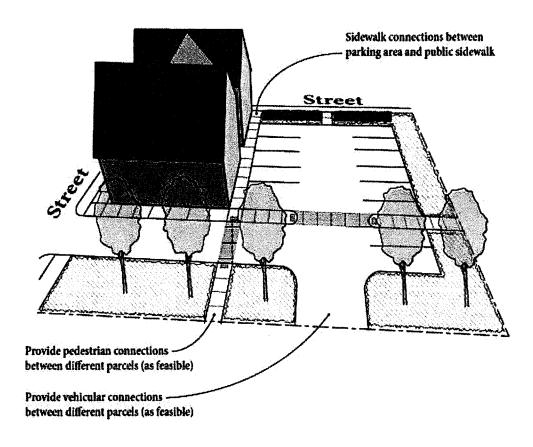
Site design showing connectivity between adjacent parcels and pathways connecting parking areas to the larger pedestrian network.
